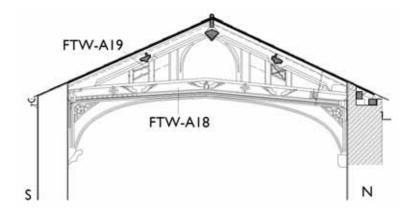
East elevation of principal truss 9 (based on truss 11), showing the location of samples FTW-A18 and FTW-A19 (Freeland Rees Roberts Architects)
